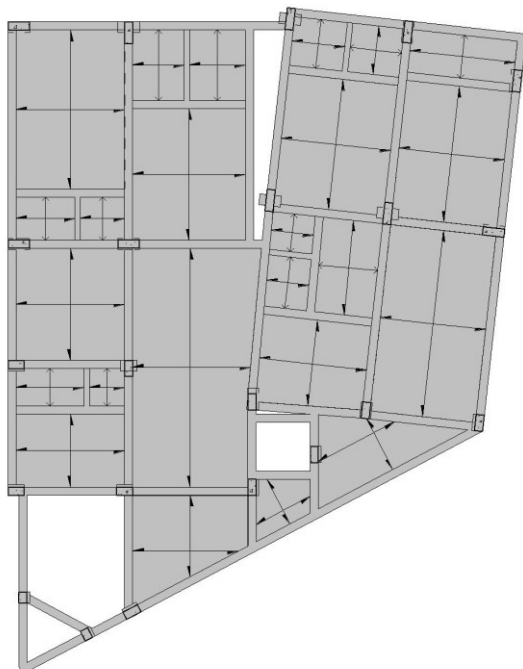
Typical Floor Framing plan with Beams and Columns Details.
